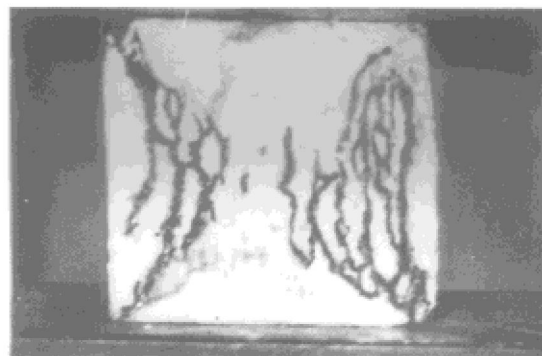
Crack pattern of cubic specimen loaded up to failure
